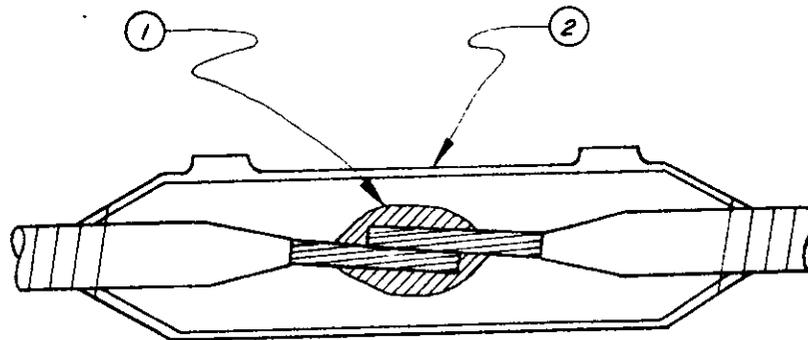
EXHIBIT VII INSTALLATION DETAILS OF GALVANIC ANODES
